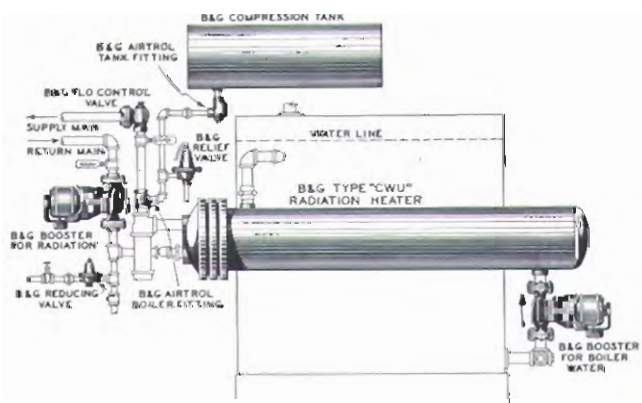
B & G Radiation Heater installed on steel boiler. Note that direction of boiler water flow is from bottom of boiler through shell of heater. If it is necessary to cut an opening in boiler, it is advisable to check with local boiler codes or laws, especially if boiler is other than a low pressure heating boiler.
